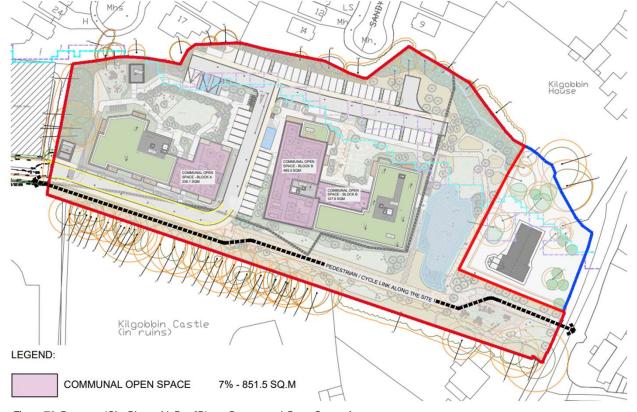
Proposed Site Plan with Roof Plan – Communal Open Space Areas
